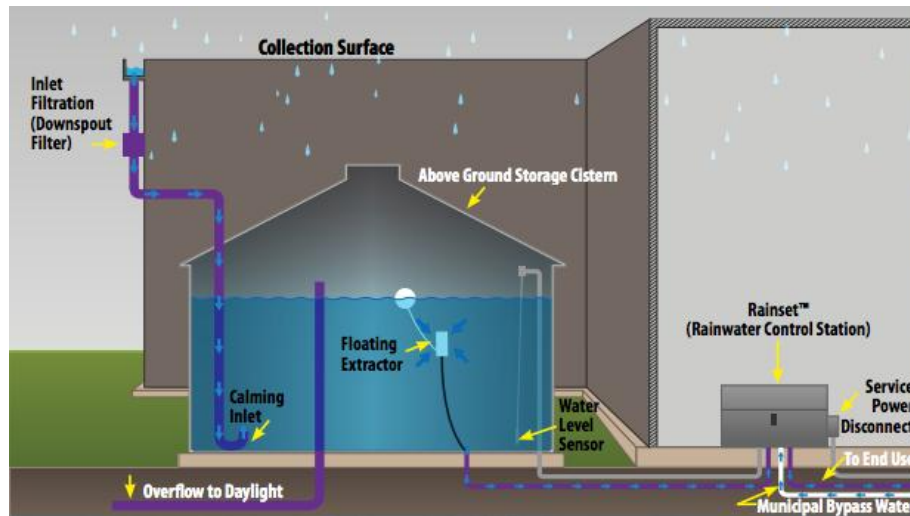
Above Ground Stormwater System (Stormsaver, 2013)
